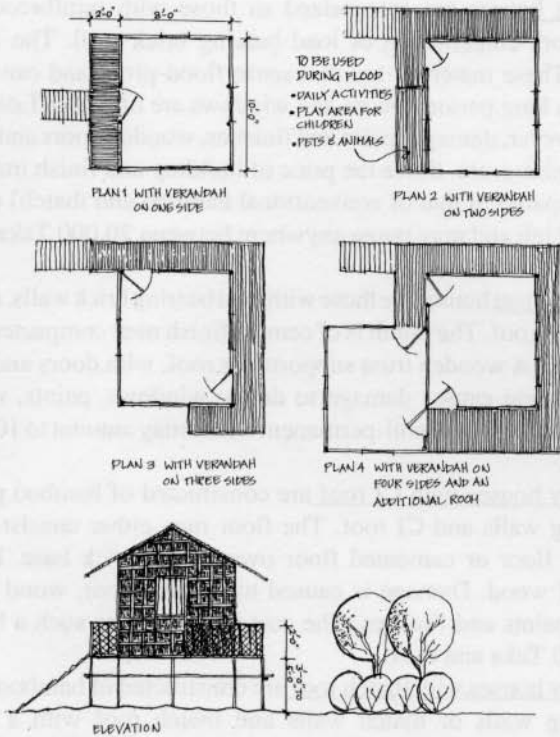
Proposed Stilt Houses for Flood Prone Areas
